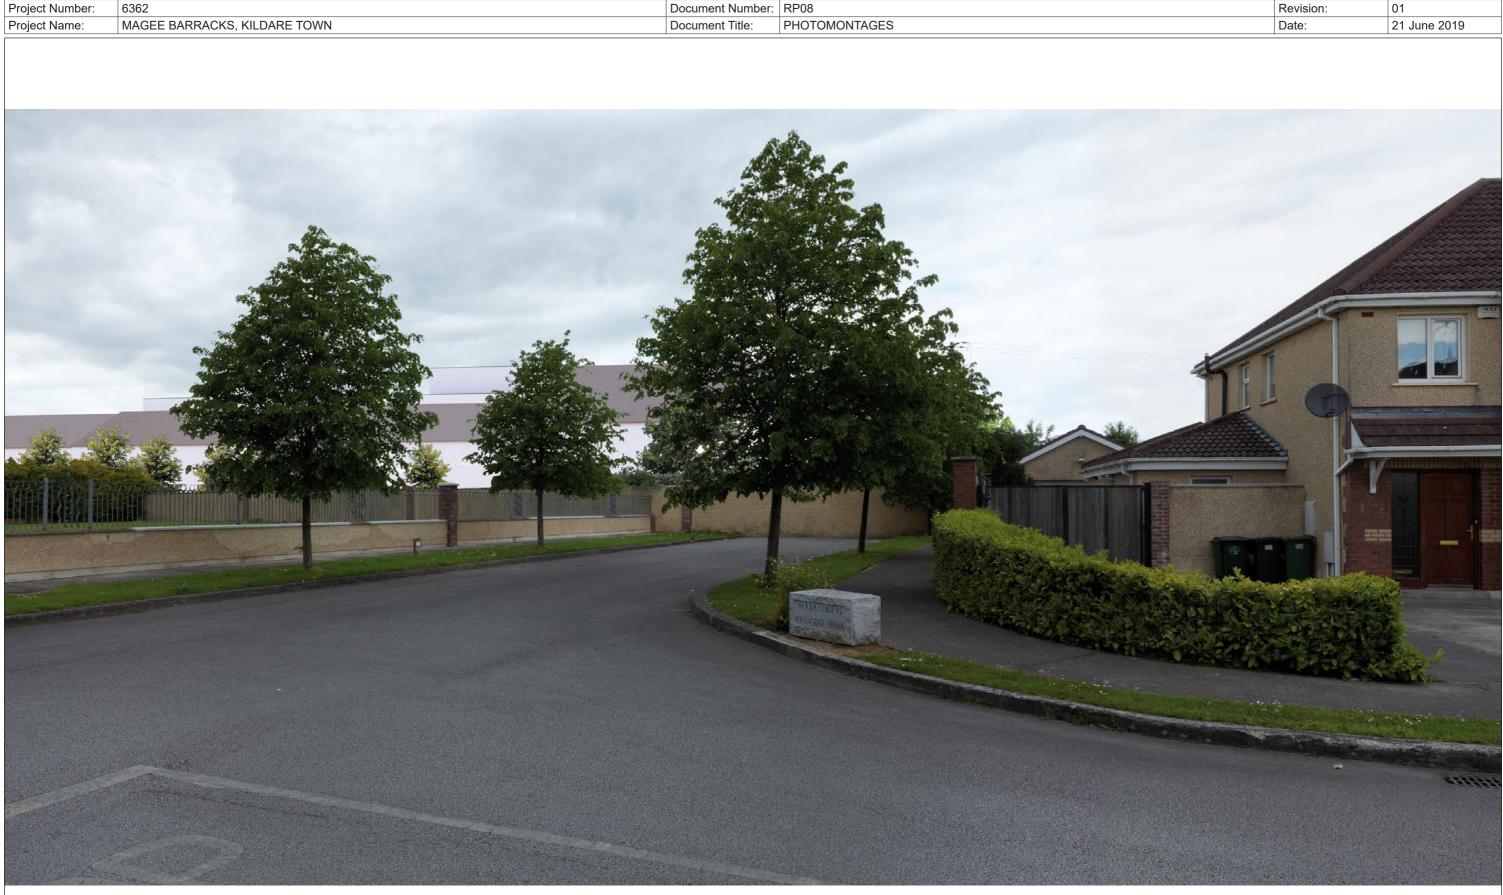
Rev: 00View 6 from Ruanbeg Crescent looking northwest
